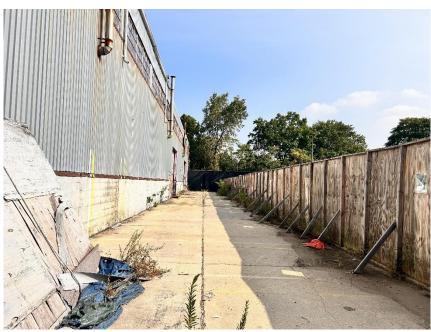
Concrete-paved area adjoining 725 Clinton Street building (left) and the commercial vehicle parking area to the east (facing north).
